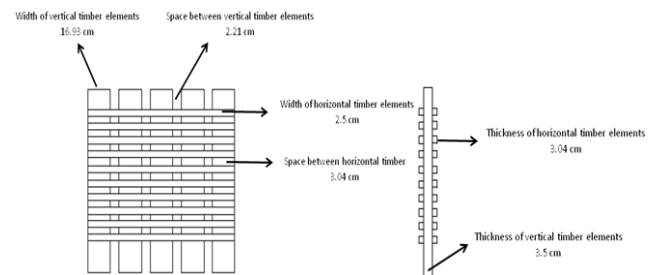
Detail for the timber structure of a typical interior tabique wall
